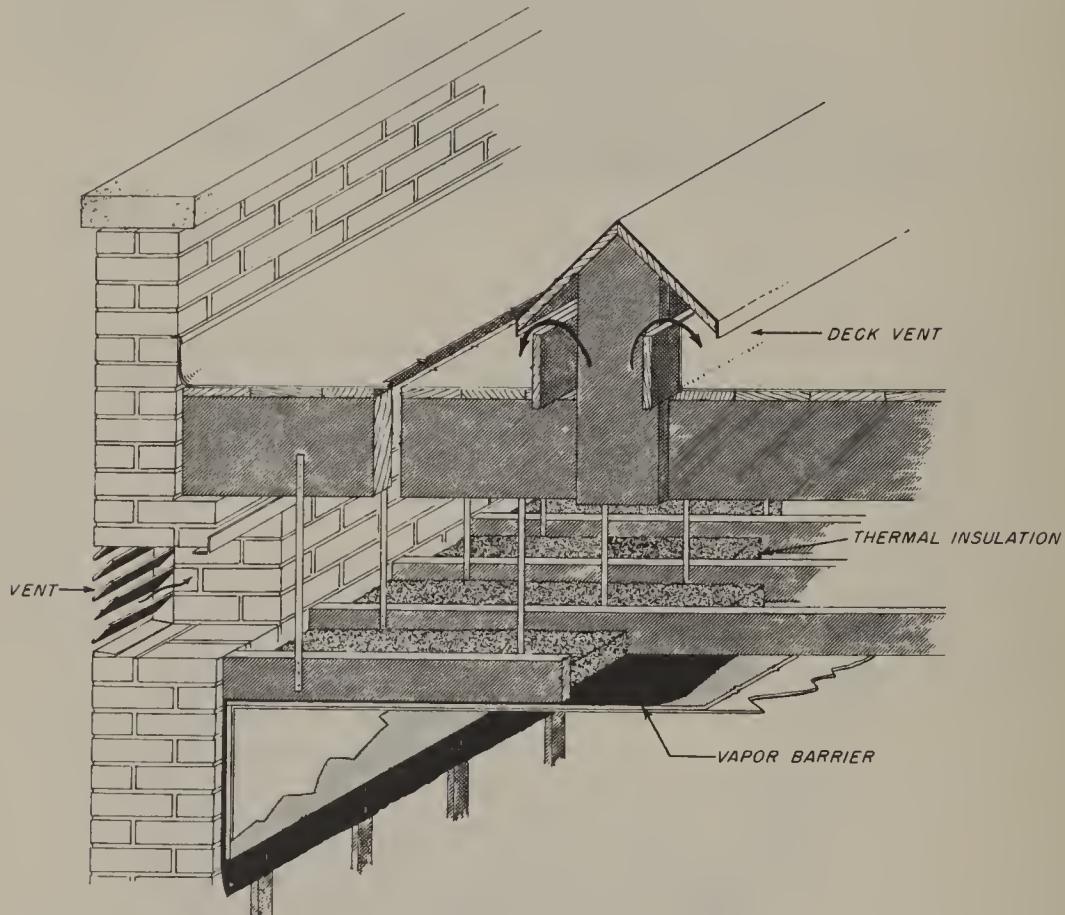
Ventilation of space below low-pitched roof deck. Condensation commonly will be found on the lower surface of the sheathing of a roof deck due to the vapor movement from the living quarters into unvented spaces between a subceiling and the roof deck. In some cases water vapor from crawl spaces migrates along outside walls or other channels into these spaces, adding to the water vapor that penetrates the ceiling area. Condensation control is obtained by vents along the sides of the building and by a deck vent running perpendicular to the run of the joists. See "Good practice recommendations" for desirable vent areas needed. Well-vented loft spaces may not require a vapor barrier in zones II and III; however, in areas where condensation is a major problem, such as zone I, a good vapor barrier should be used in the ceiling. Other methods of including thermal insulation and vapor barriers are shown in figure 44. Where ventilation in loft side walls is effective and in the proper amount the center deck vent may not be necessary.
